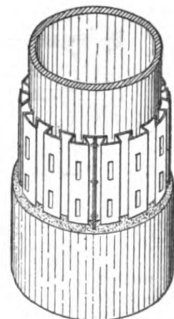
Furring Used for Covering Columns and Steam and Hot-Water Pipes.
